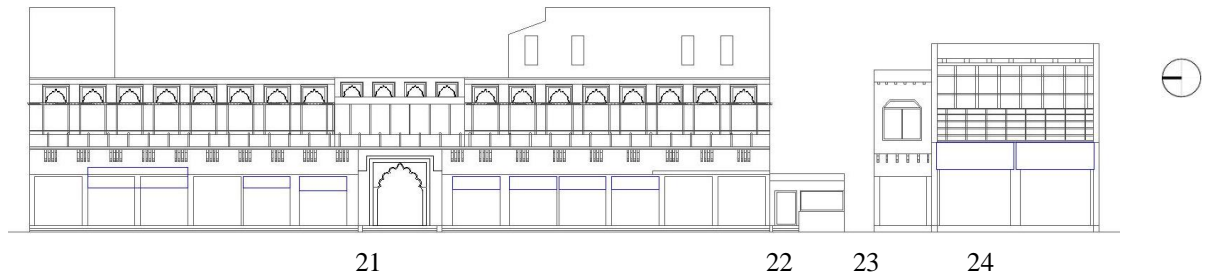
(c). Elevation 1 of patch 2 (Source: Author)
